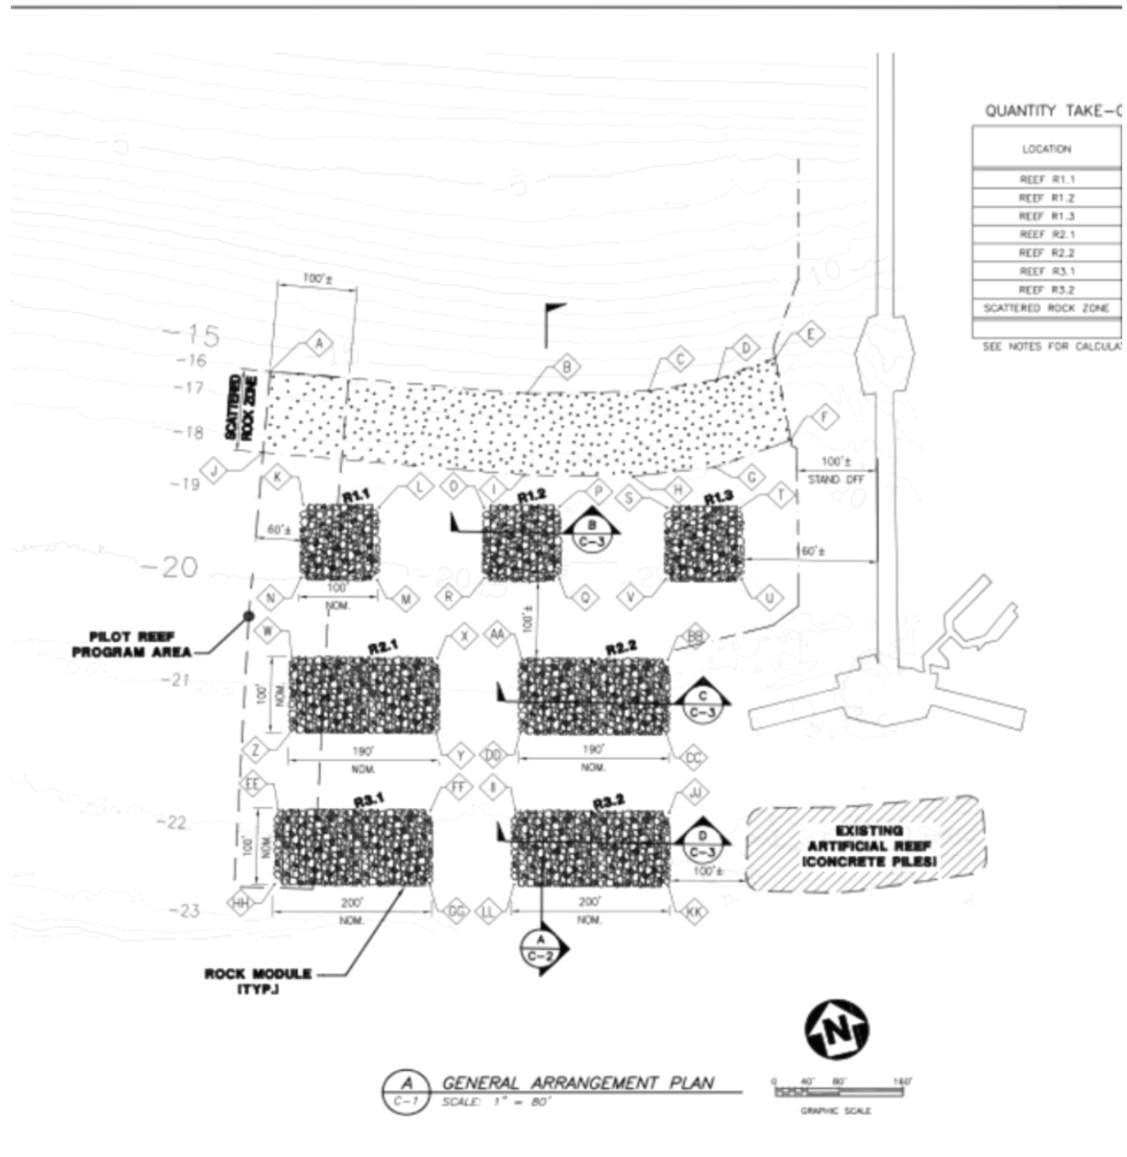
Detail of the Belmont Pier Artificial Reef design showing the reef module layout.
